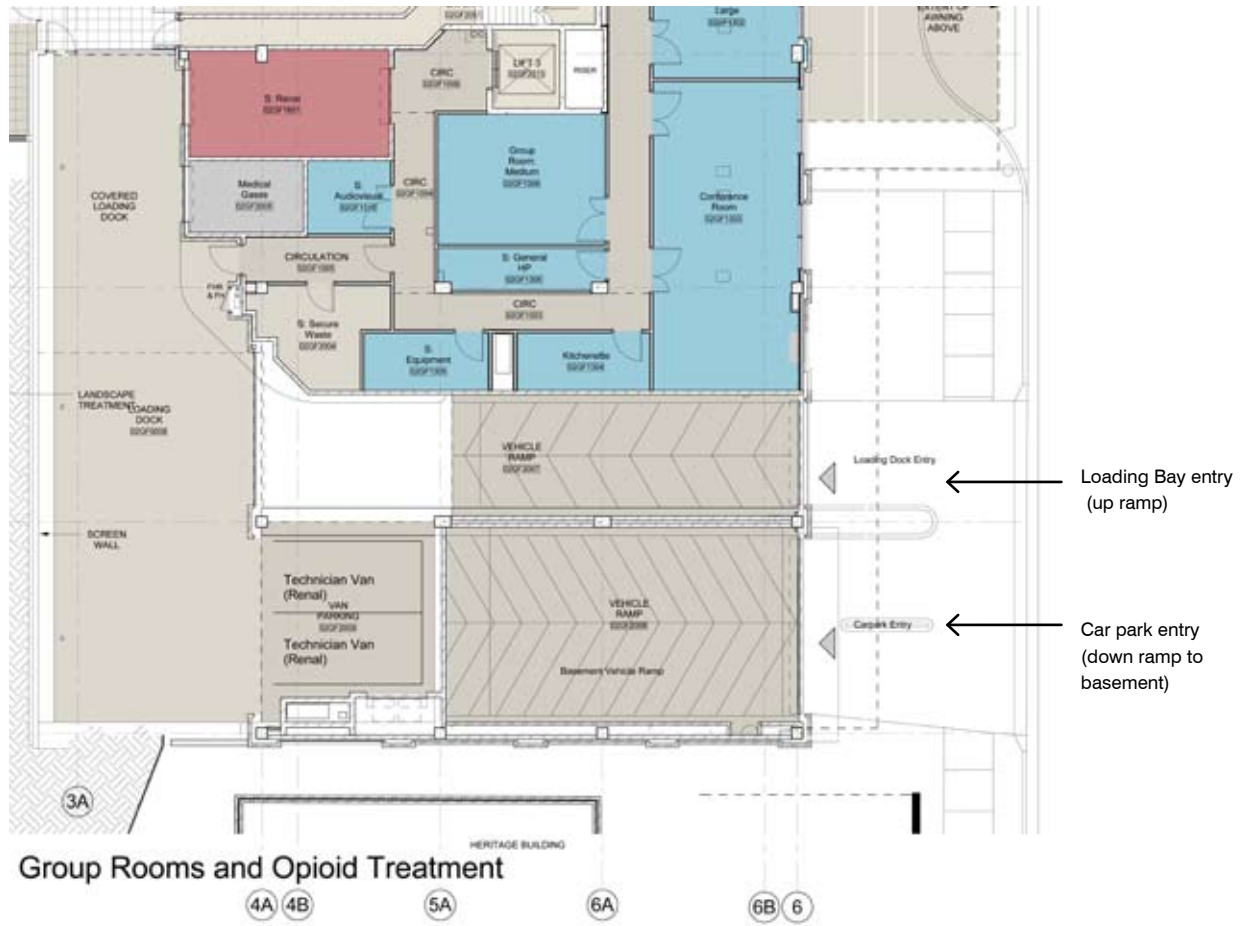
Extract Ground Floor Plan showing vehicular entry points.
